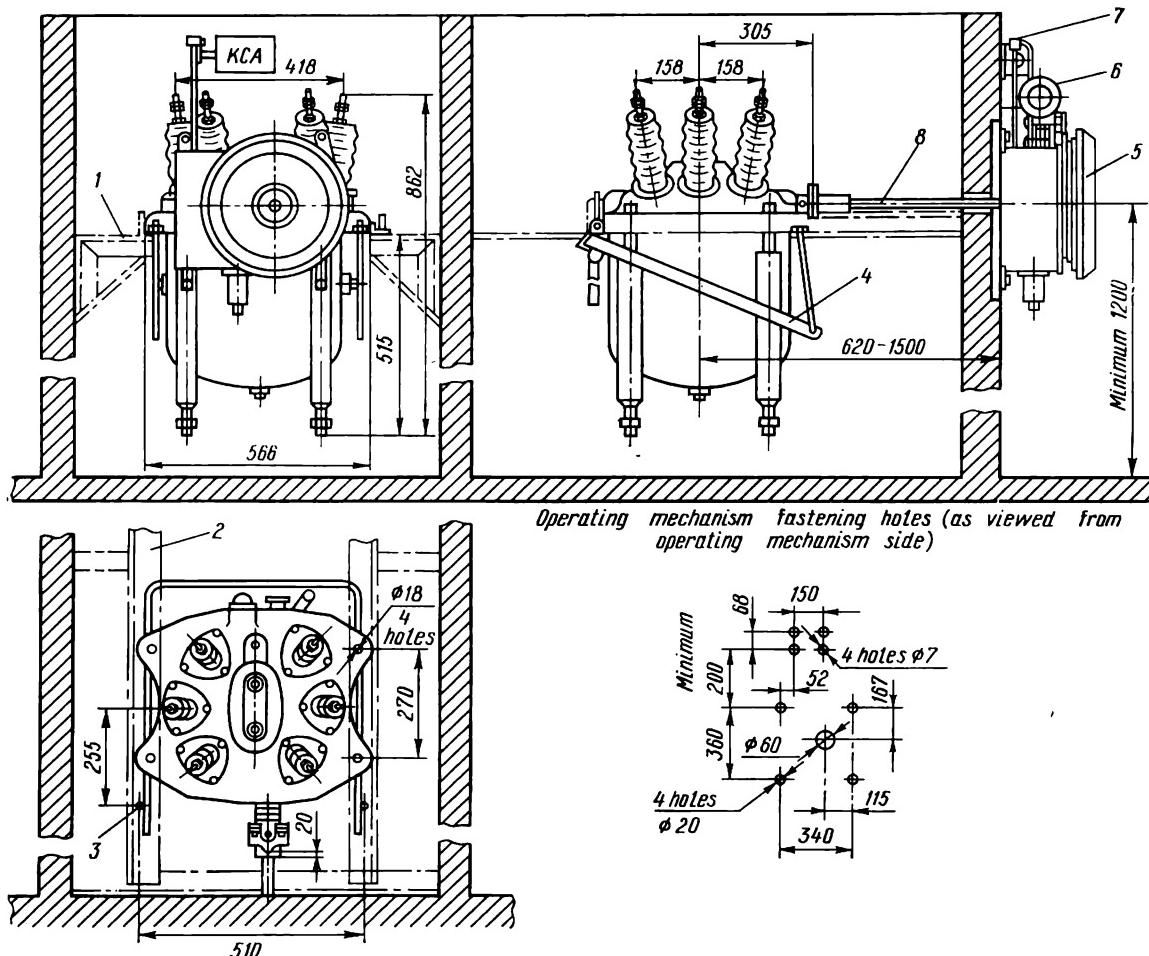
Mounting the ВМБ-10 circuit breaker with ППМ-10 spring-loaded operating mechanism
